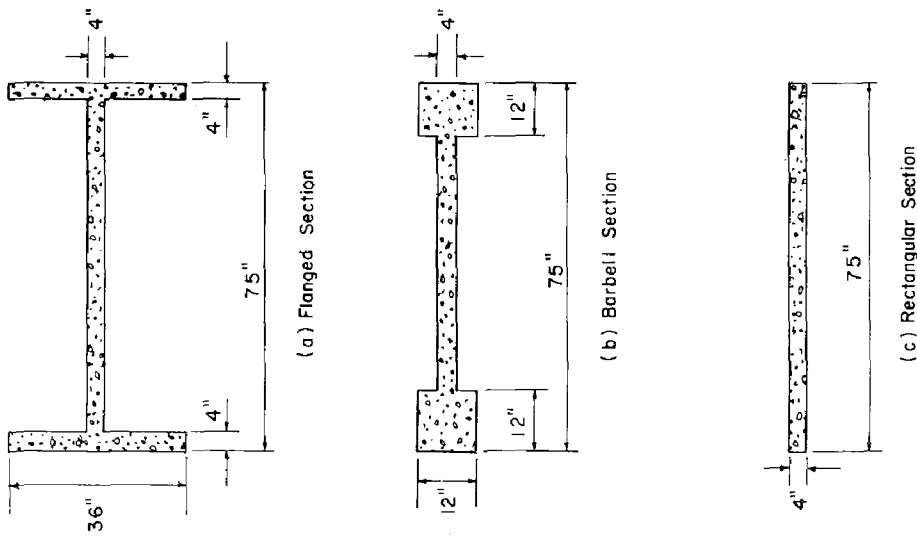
Nominal Cross-Sectional Dimensions of Test Specimens (1 in. = 25.4 mm)
